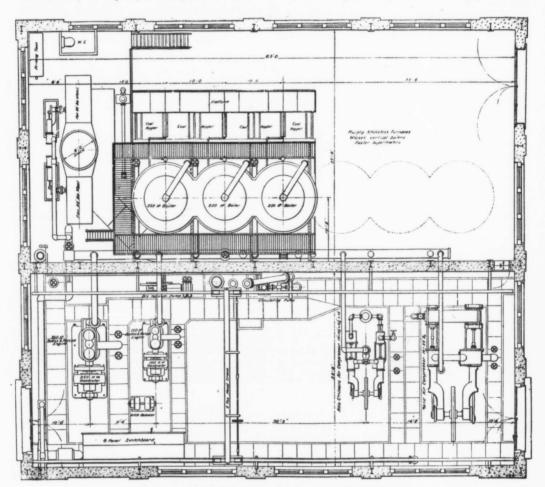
Plan of Power Plant, Canadian Locomotive Works, Kingston.
